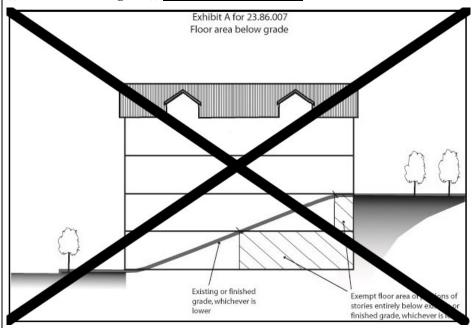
Underground floor area Existing or finished grade, Underground floor area whichever is lower
